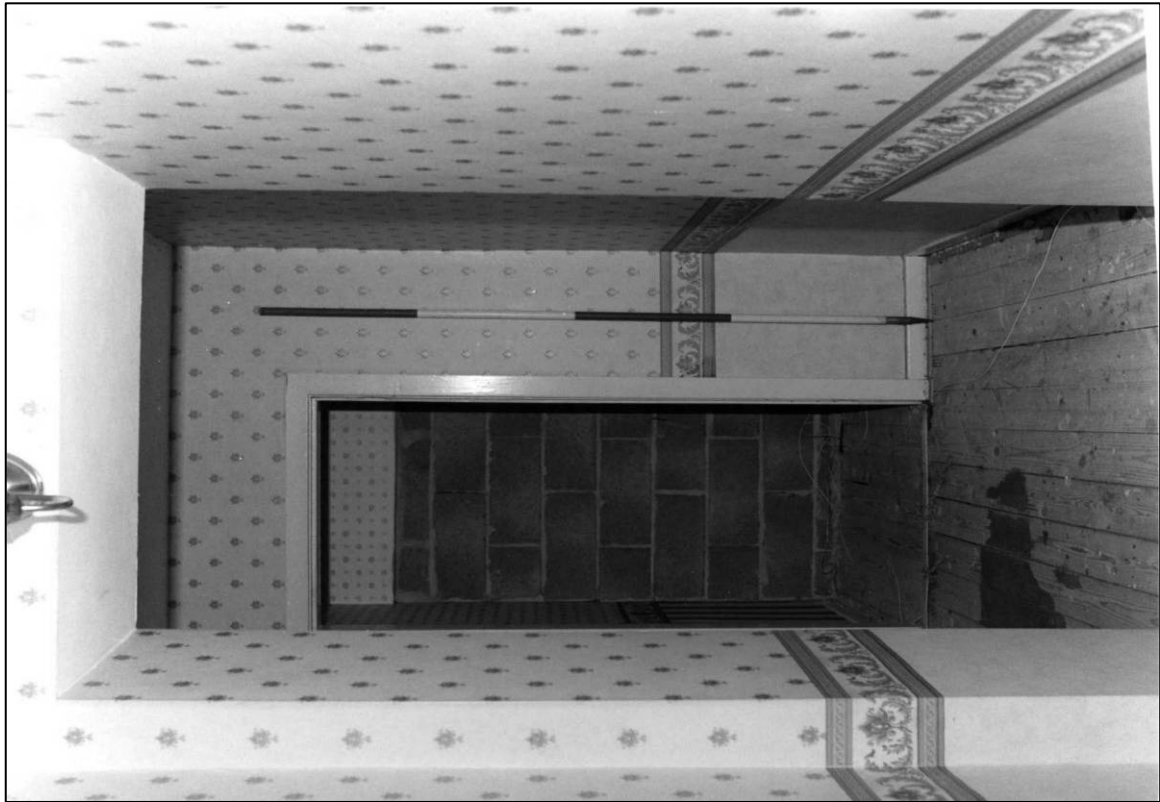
Barn Cottage range, N part, first floor corridor, looking S (photo 12/2) (top to left).
